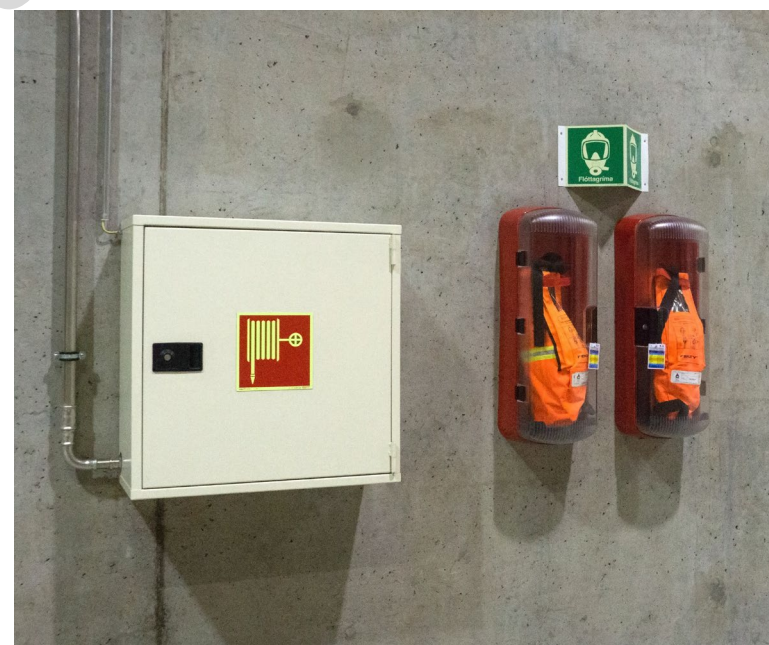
Fire-fighting equipment in the Fljotsdalur power station
